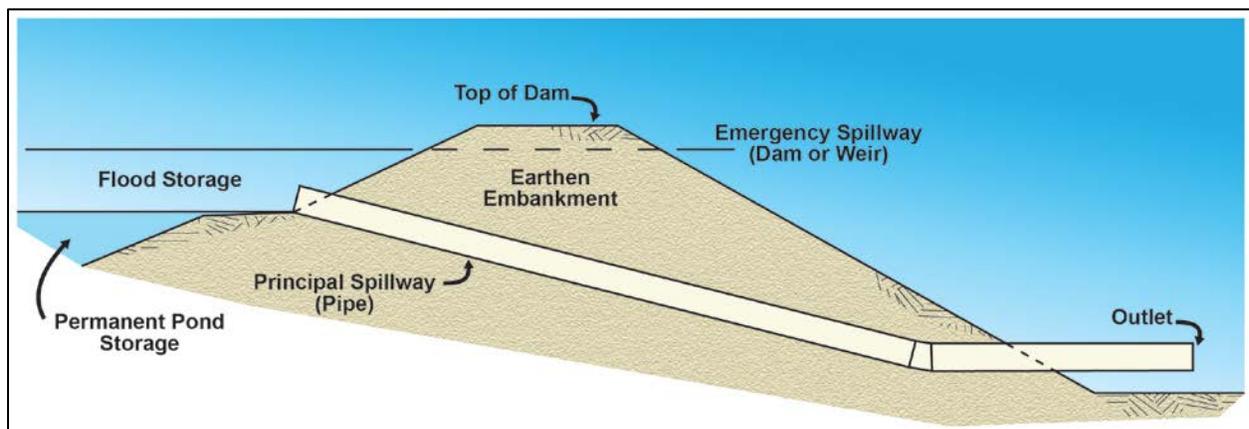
Schematic of a pond constructed to provide flood storage.
